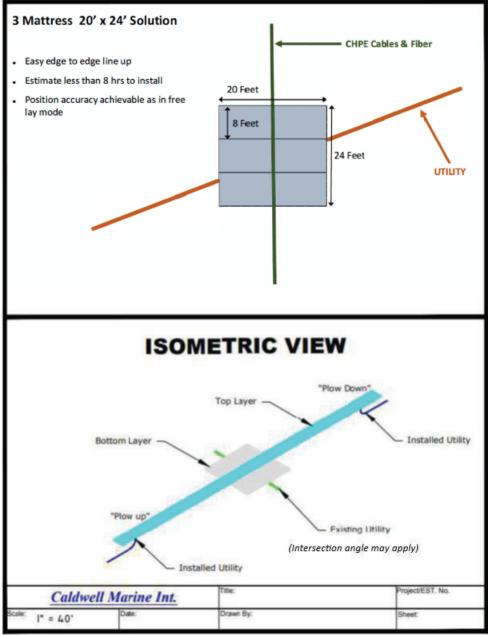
'Typical' Utility Crossing Pattern (Concrete Mattresses)
